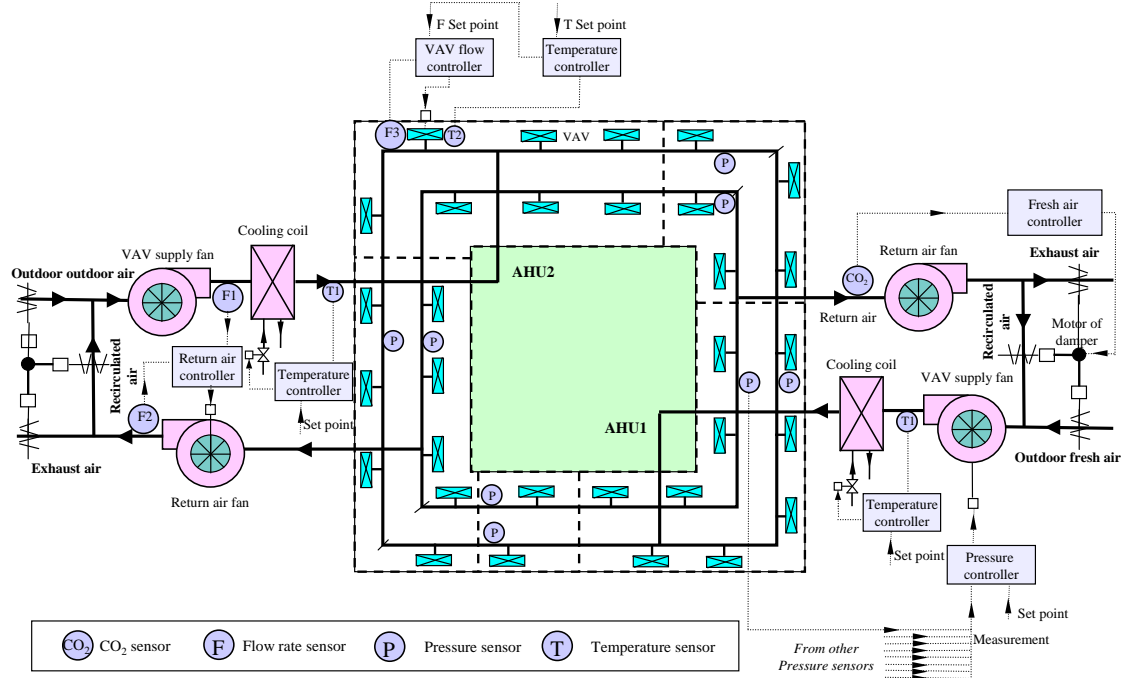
Schematic of the multi-zone ventilation system in the typical floor
